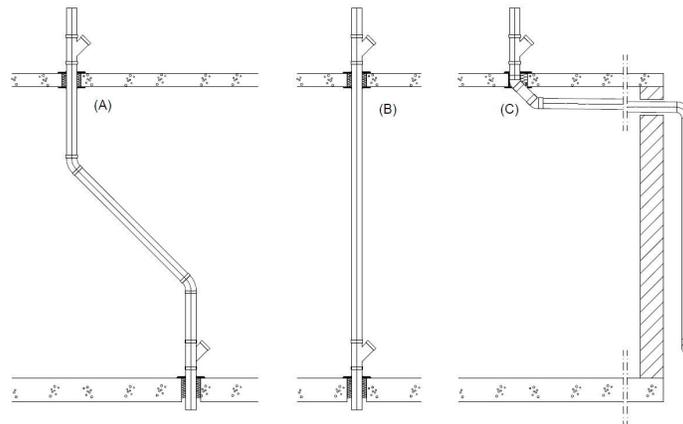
(A) Offset vertical, (B) straight vertical and (C) a horizontal pipe installed in the measurement room
